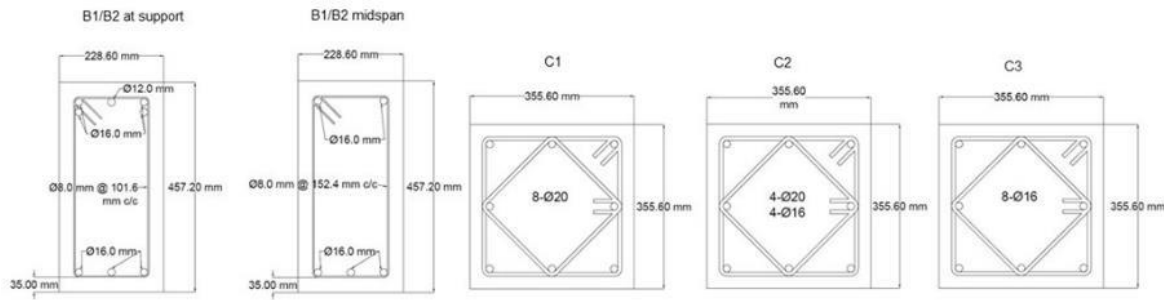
7 Beam and column section properties of Pahar Trust template school (Pahar Trust, 2019)
